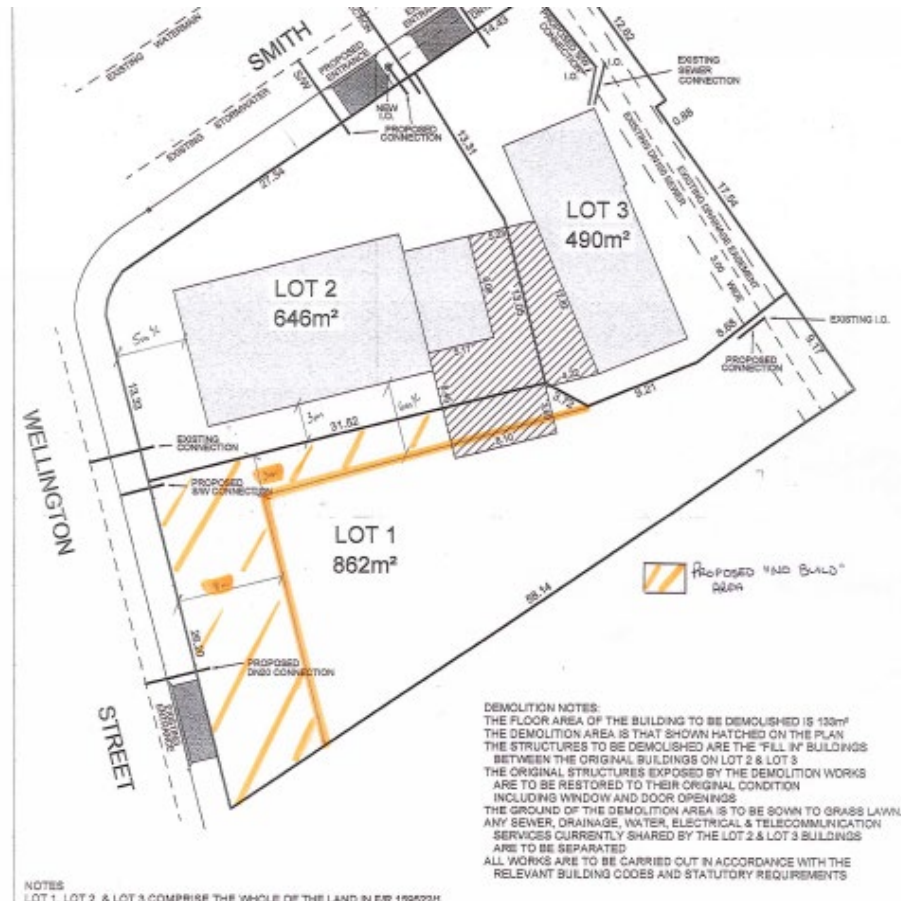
Proposed building envelope notating the 'no build area' in hatching.
